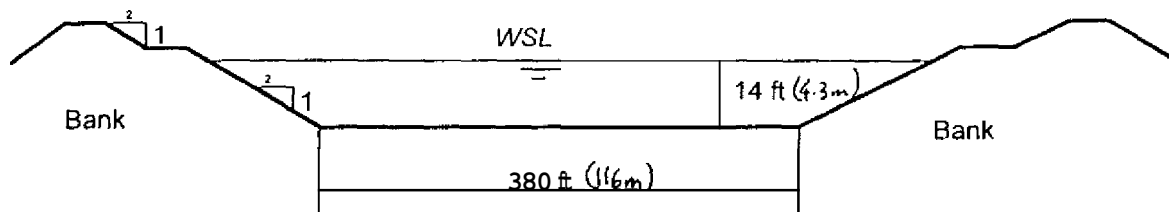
typical cross section of Chashma Right Bank Canal
